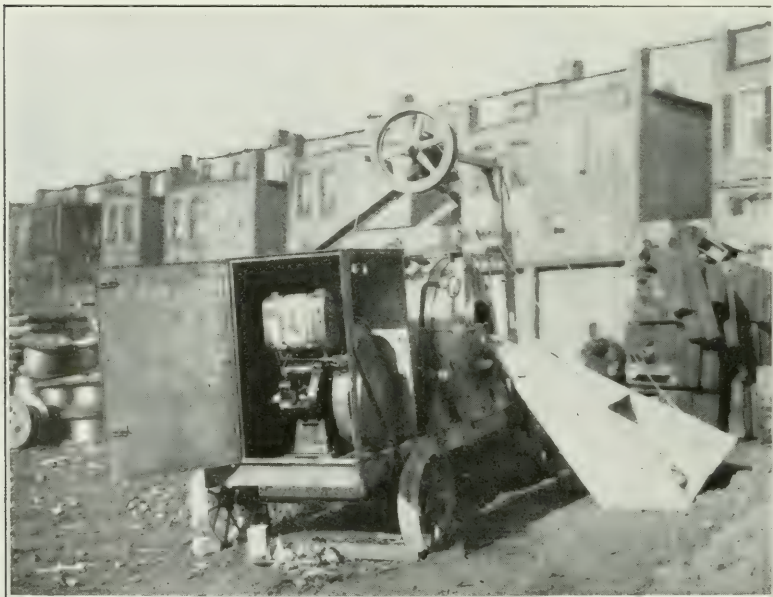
Concrete Mixer Adapted to Meet Telephone Construction Requirement
